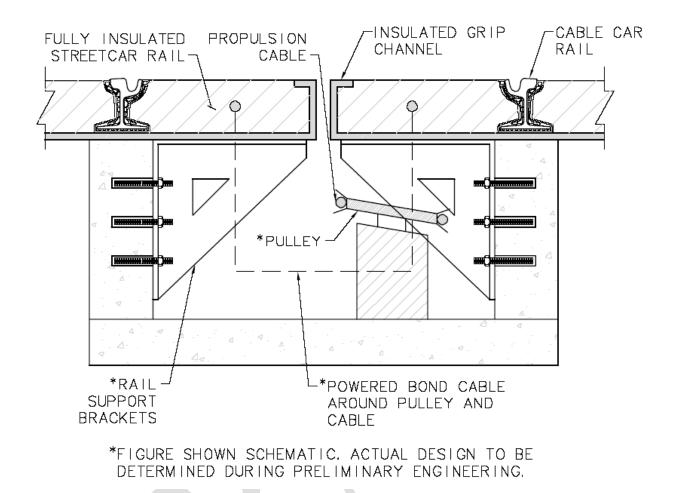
Conceptual Section of Crossing (Looking down Cable Car Alignment)
